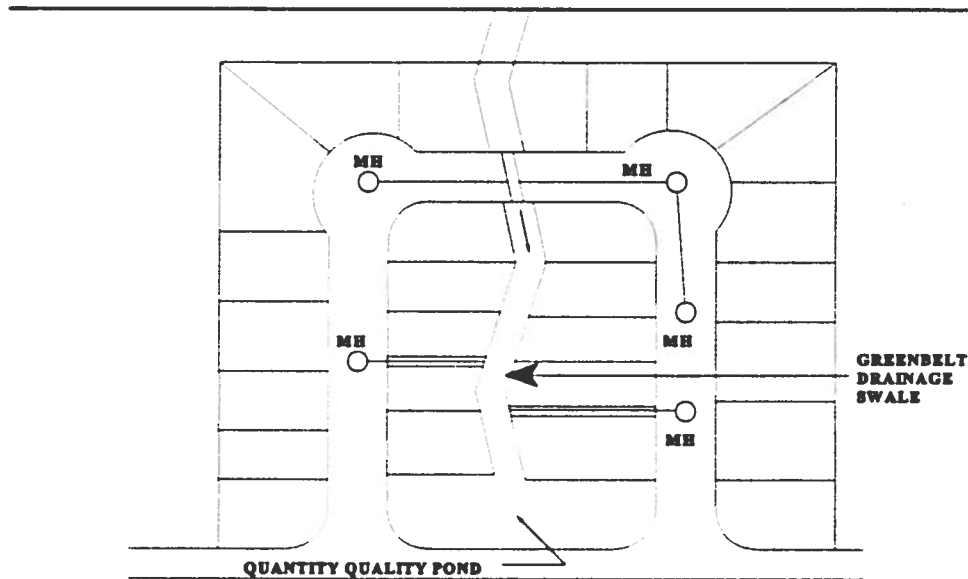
Example of a curb & gutter drainage system with storm sewers and backyard swales
